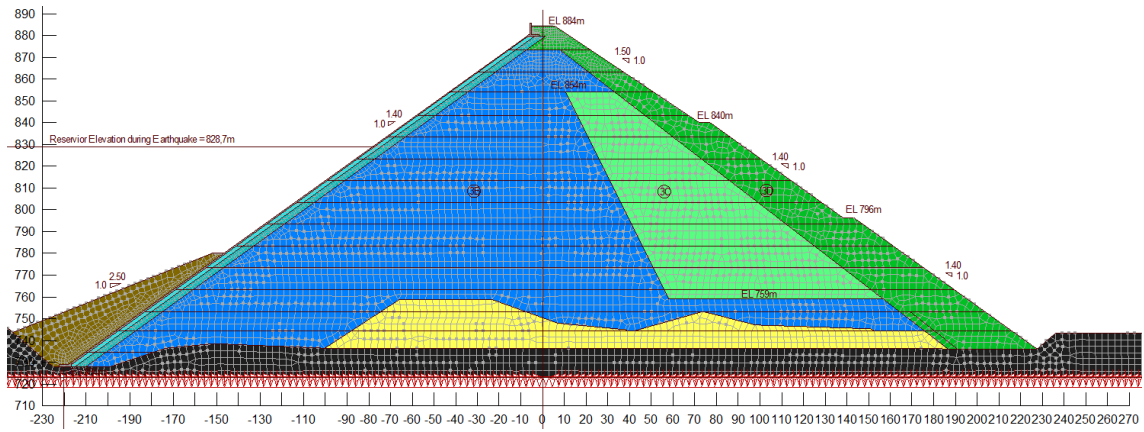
Zipingpu dam model – layered construction – last layer + 1A material placement
